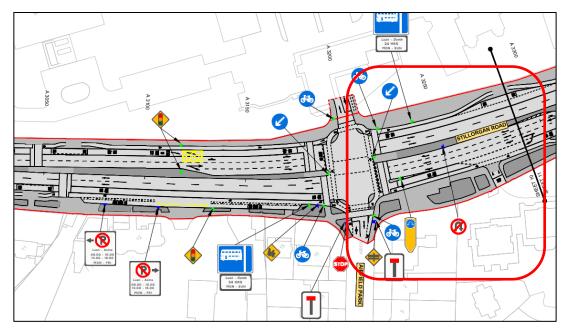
Extract from Traffic Signs and Road Marking Drawing (Sheet 10)
